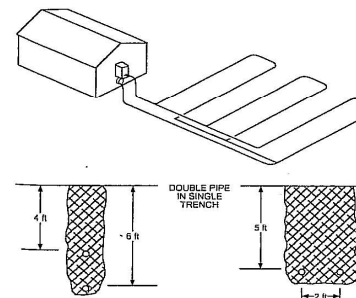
Horizontal Ground-Coupled Heat Pump Piping
